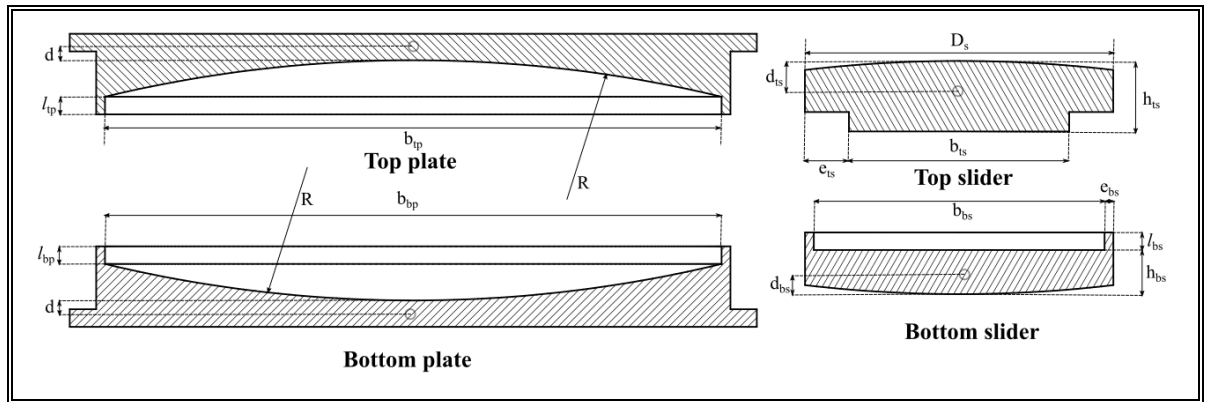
Geometrical design parameters of the LIR-DCFP bearing.
